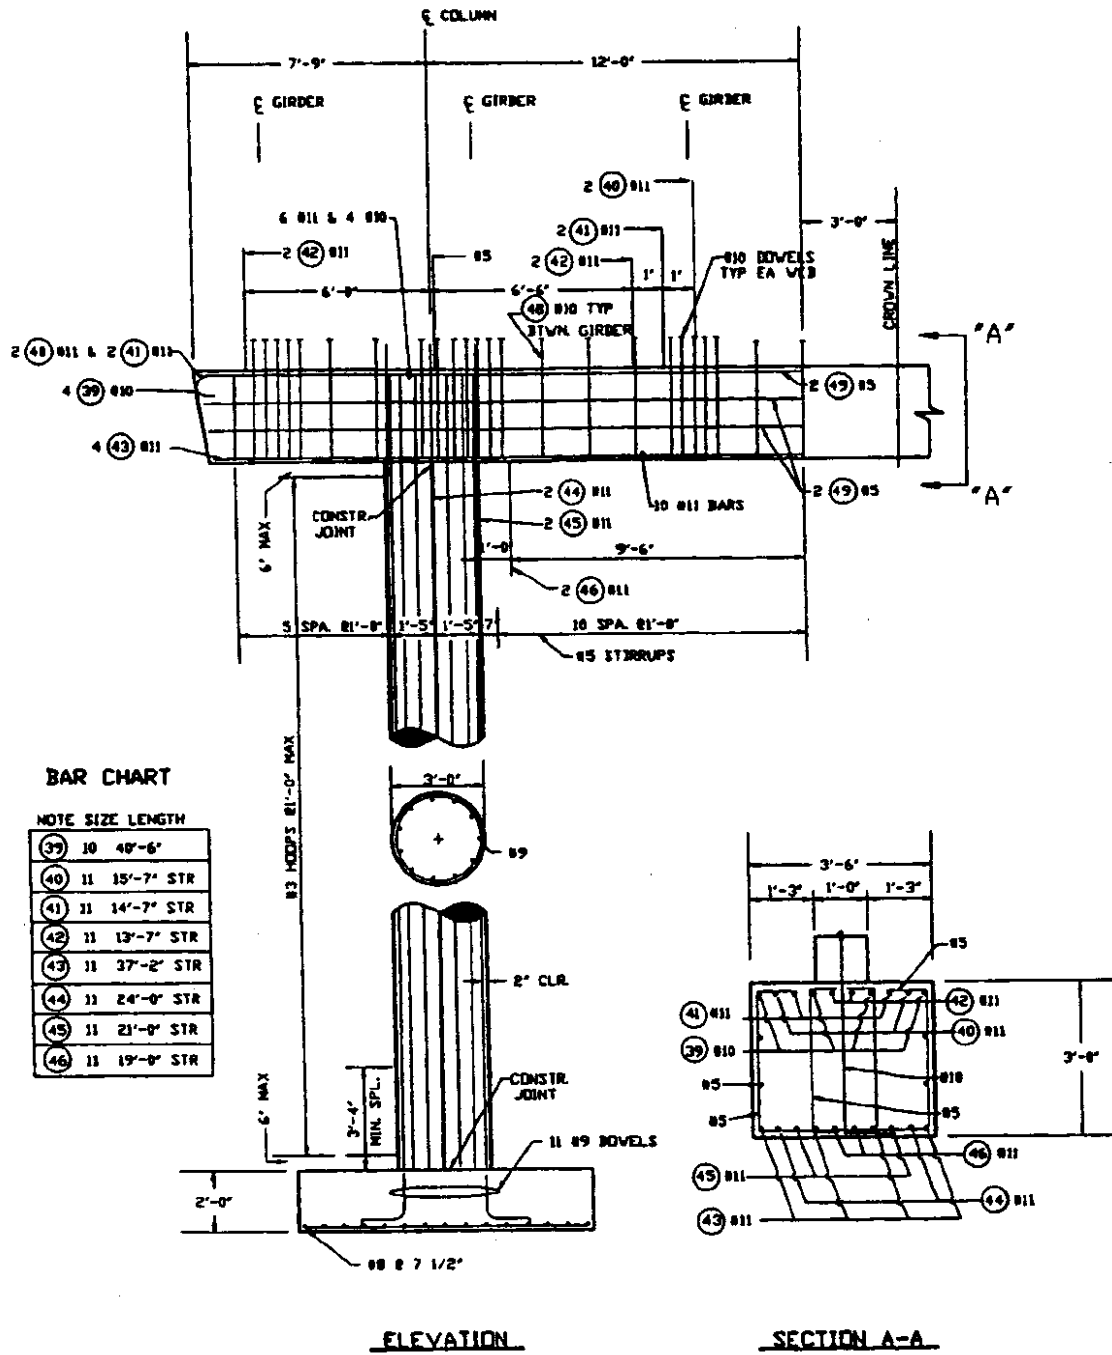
Moses Lake bridge bent column, crossbeam, and spread footing foundation details. Adapted from [39].
